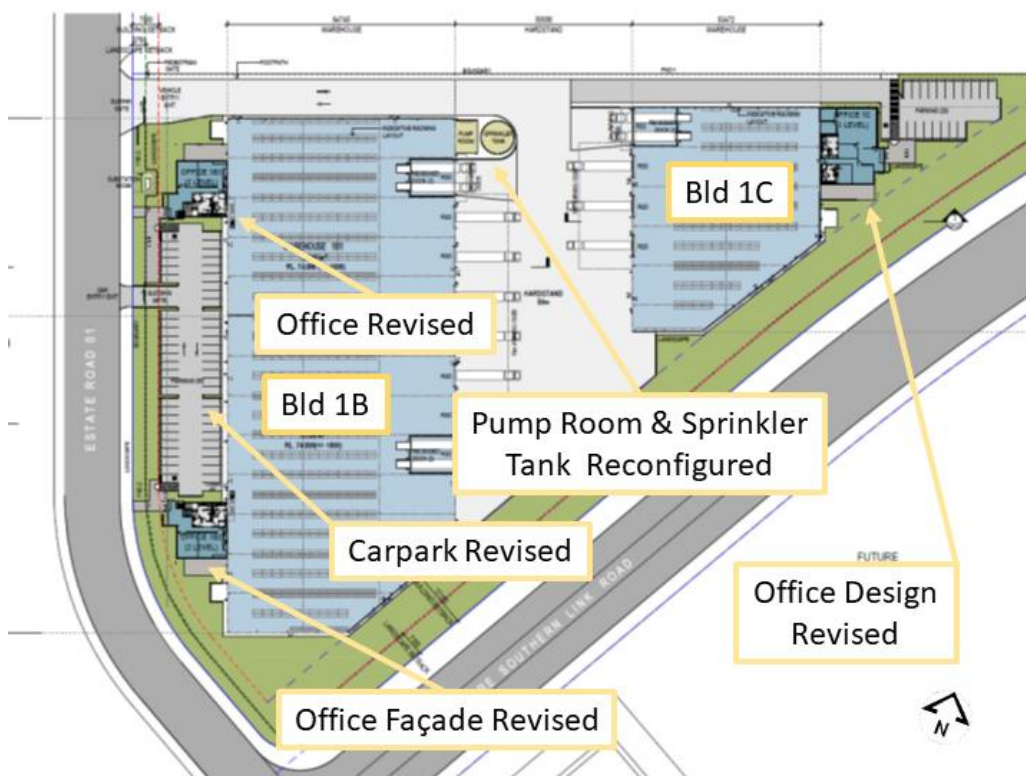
| Proposed Amendments to Buildings 1B and 1C
